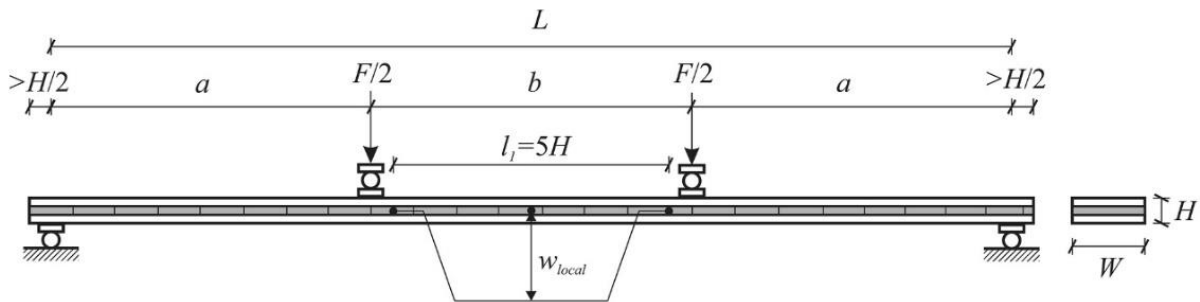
Test set-up for bending perpendicular to the plane ($a = b = 6H$) and rolling shear test ($a = b = 3H$) [1]. adapted from [17]
